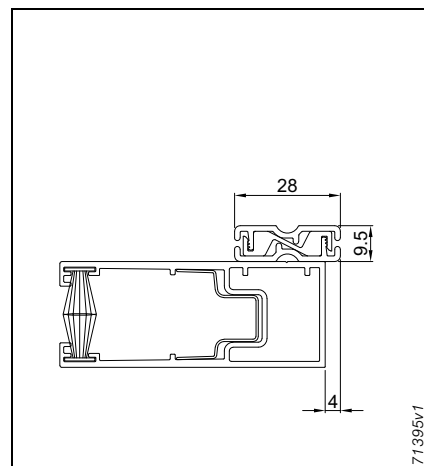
Mounting rear ventilation profile between fixing level and guide rail
